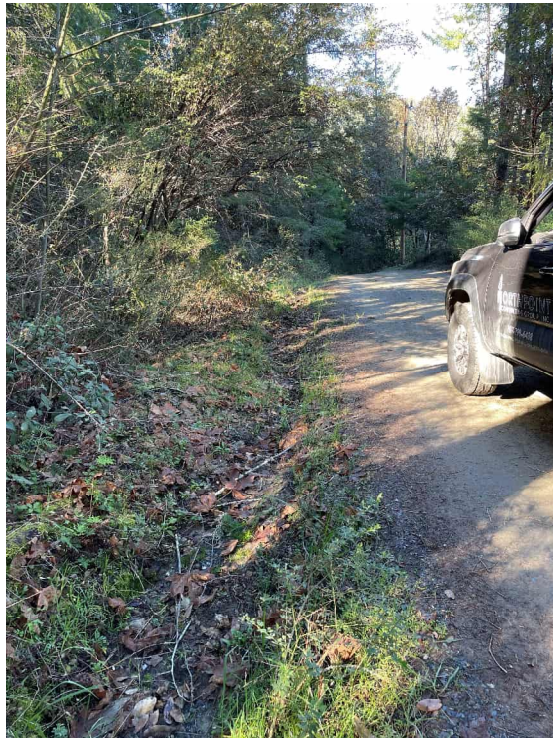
RP 7. Milky Way Loop – Inboard Ditch. Image shown facing south; towards Highway 101.
